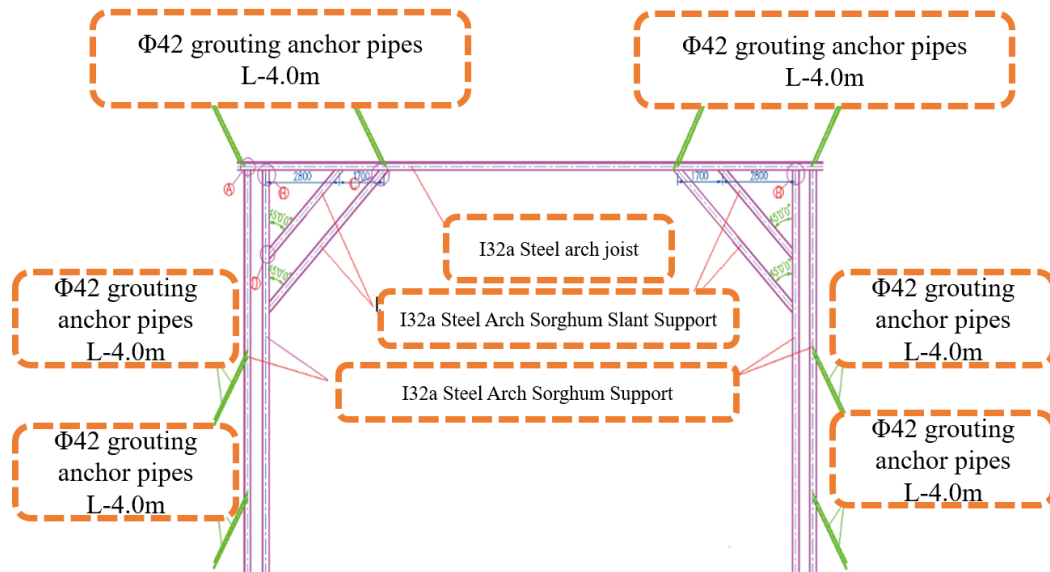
Structural diagram of support beams for the expanded section of the underground wind turbine room and the left and right line liaison ducts.
